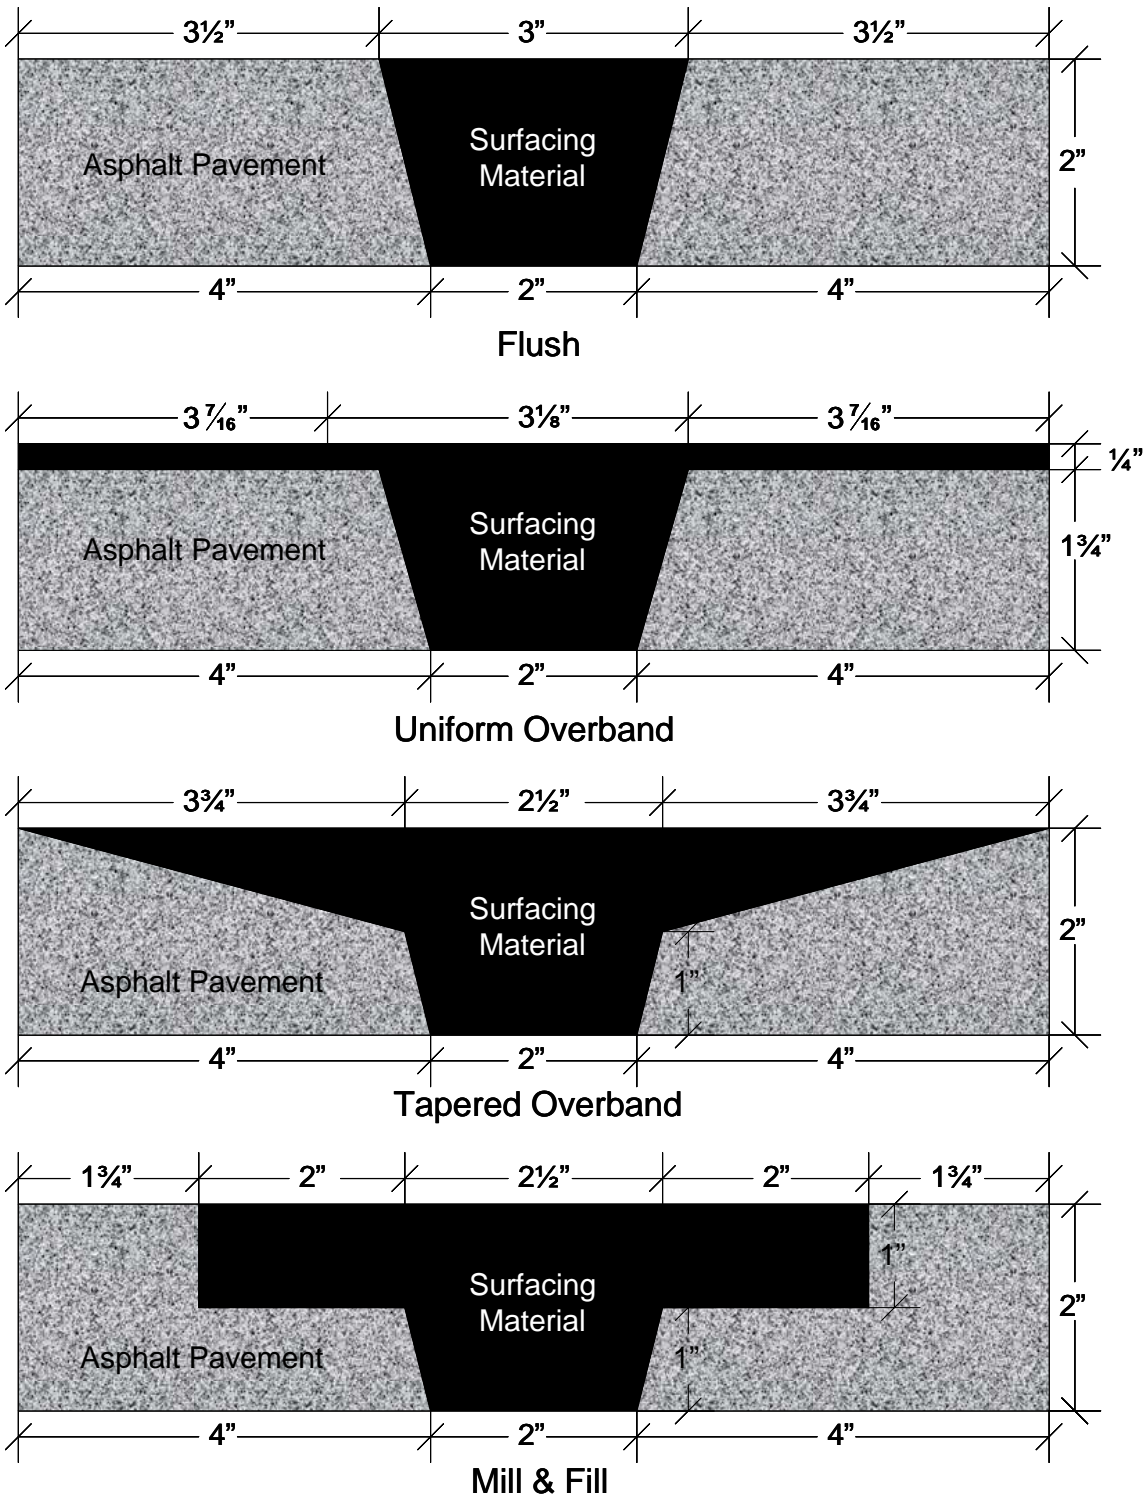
Laboratory Crack Surfacing Material Configurations and Dimensions
